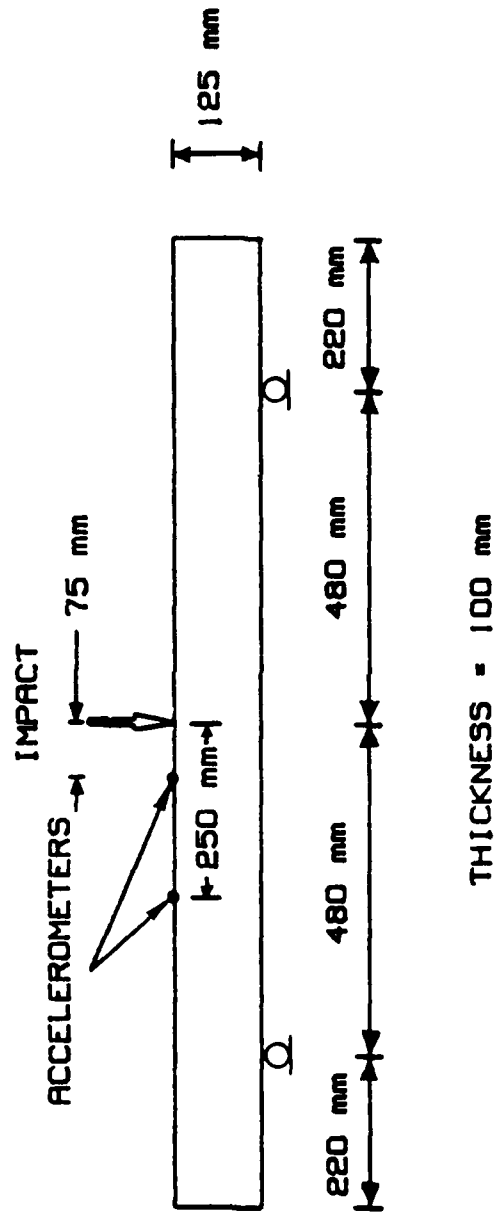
Mindess' Impacted Concrete Beam Test Specimen No. 1, Ref. [88]
